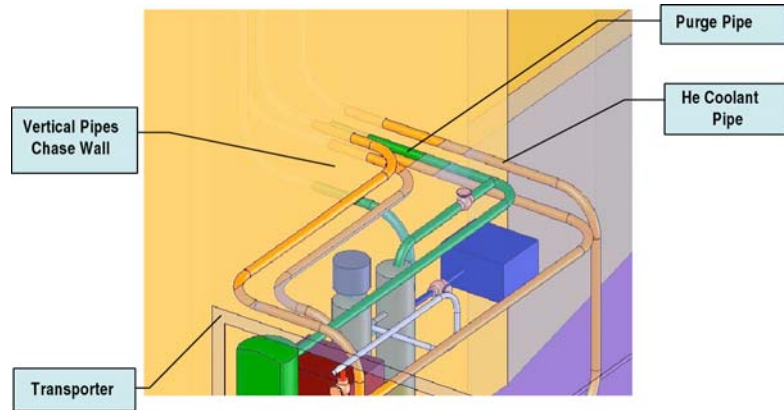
Transporter side wall pipe penetrations to vertical pipe chase area.
